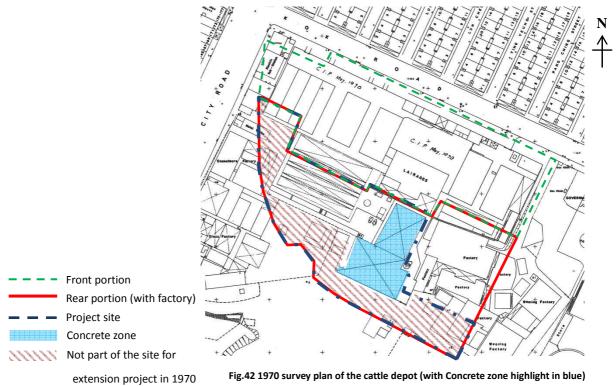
1970 survey plan of the cattle depot (with Concrete zone highlight in blue)
